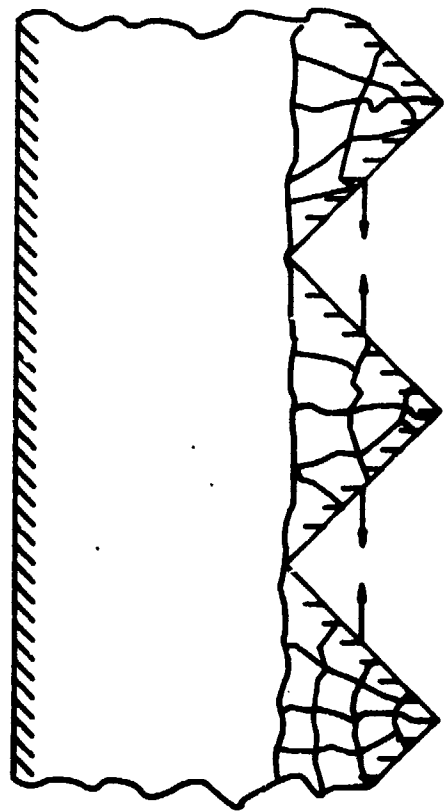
Spall will leave parallel to the wall and impact neighboring spall.
